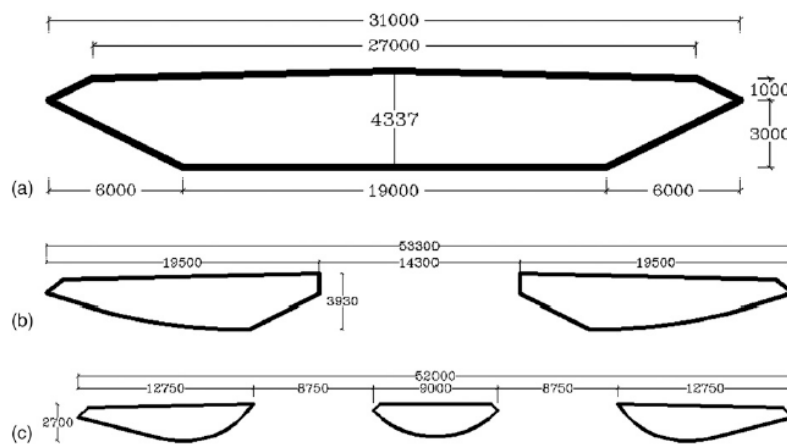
Cross-sections of decks: a) Storebaelt Bridge, b) Stonecutters bridge, c) Messina bridge (from [15])
